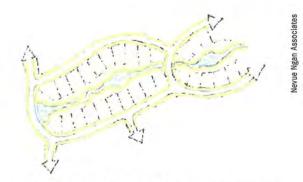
A redesigned site plan with a well-connected stormwater system. Rainfall is collected and conveyed through interconnected rain gardens, creating a more natural condition while still allowing development to occur.
